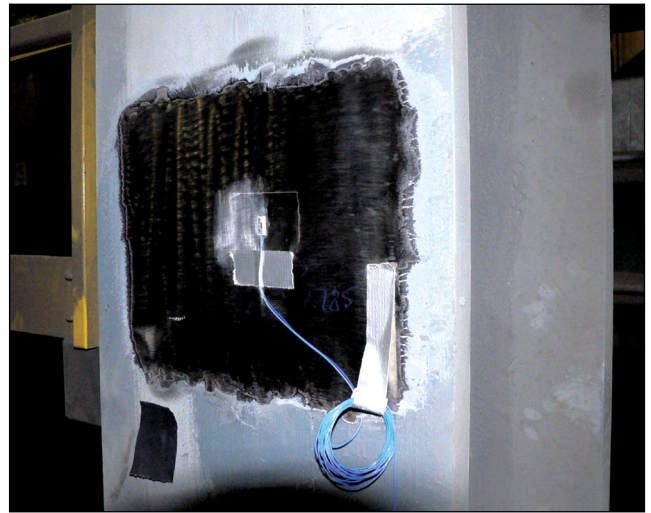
Piezoelectric gage mounted to building column flange at web centerline.
